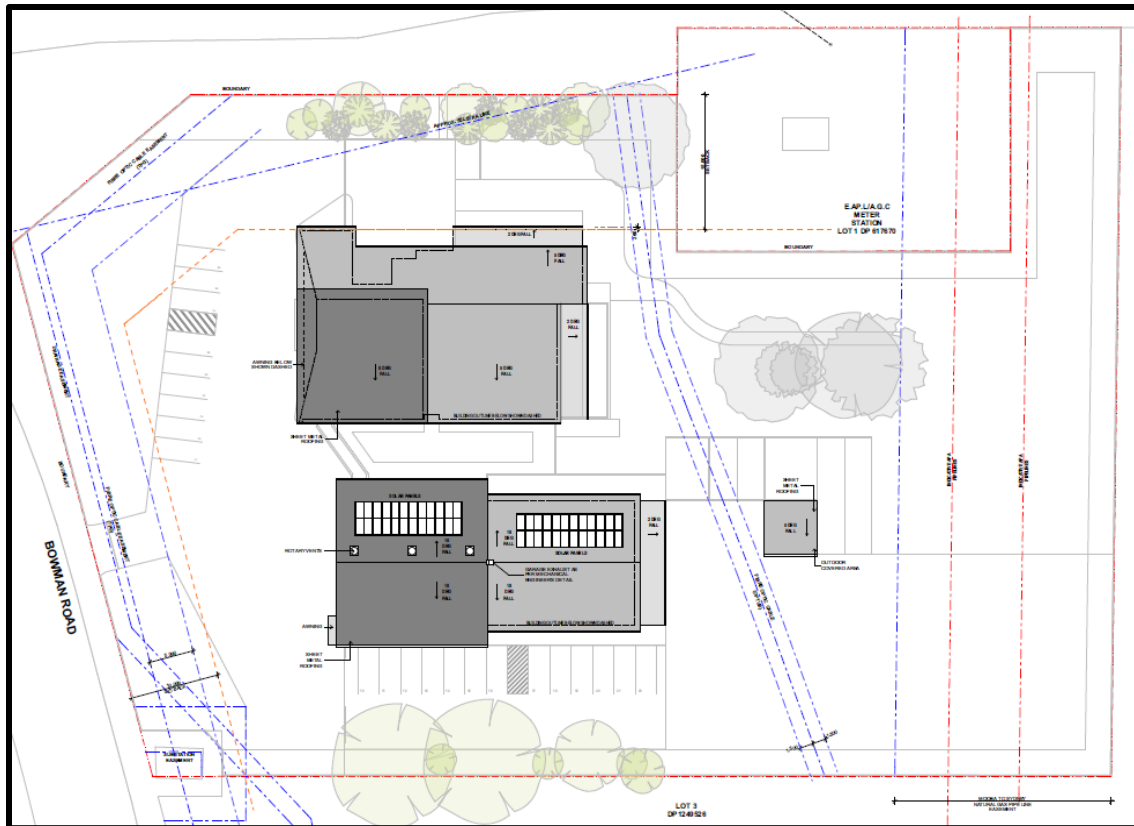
Roof Plan (Source: Figgis + Jefferson Tepa)
